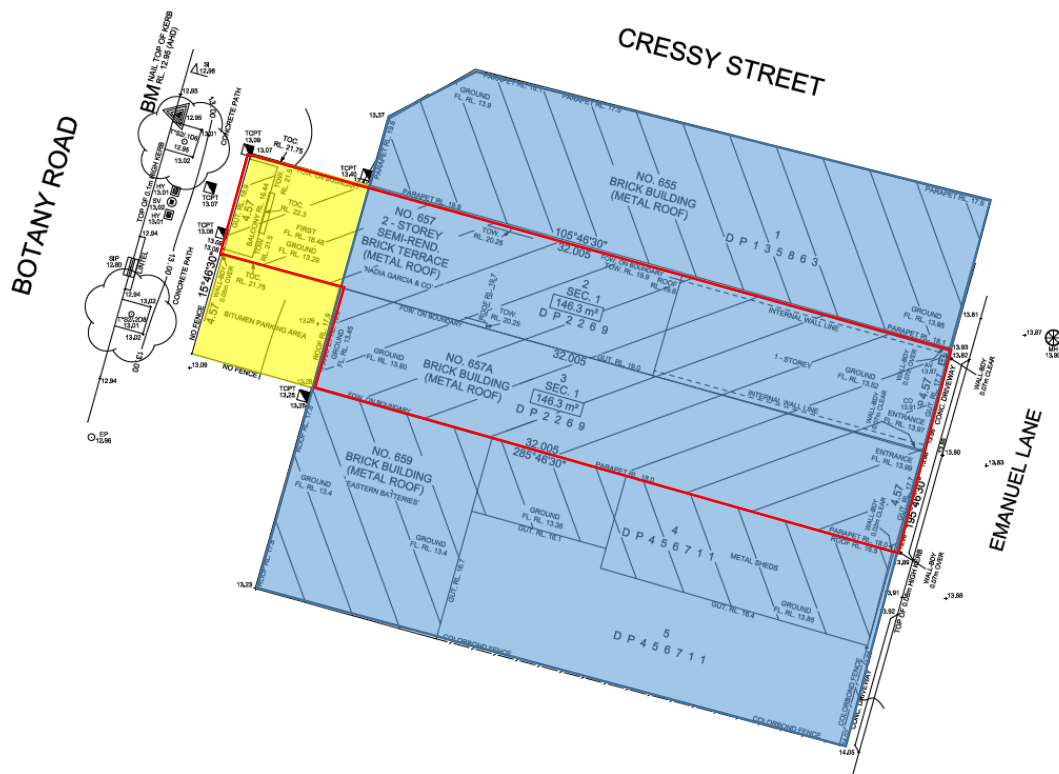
Survey plan demonstrating existing structures on the site within SP2 zoned land (yellow) along Botany Road and the location of B4 Mixed Use zoned land (blue).
